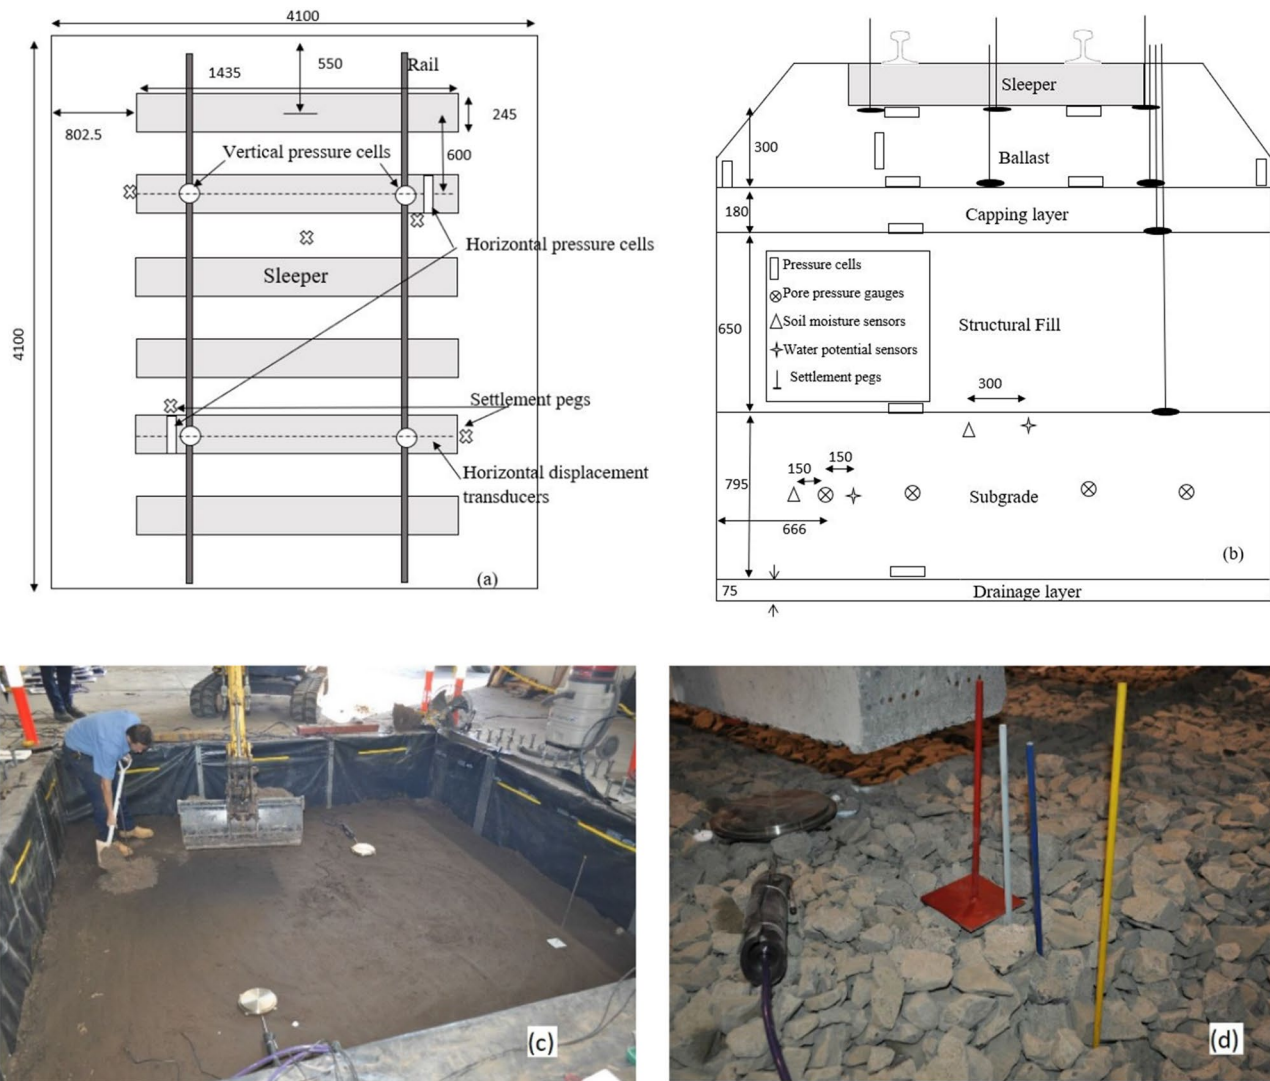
a Plan view and b Cross section view of instrumentation at NFHRT c Installation of pressure plates in subgrade d pressure plates and settlement plates at sleeper base (sourced from Indraratna et al. [38])
